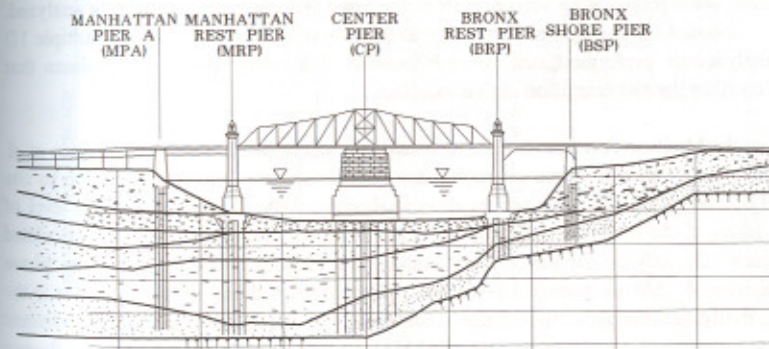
The Madison Avenue Bridge over the Harlem River in New York.
